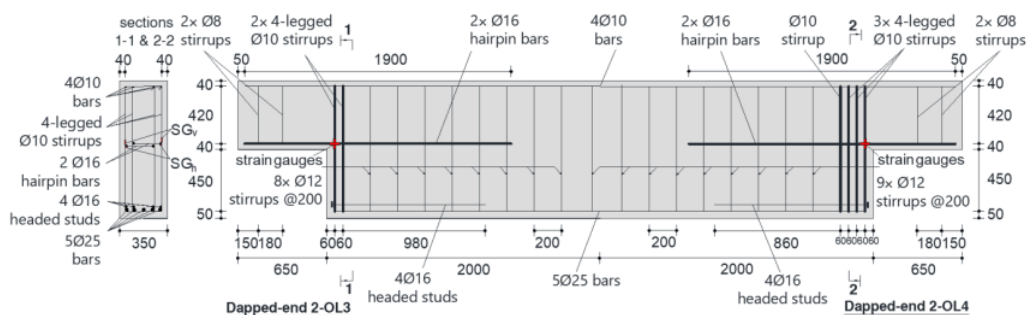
Geometry of the specimens and reinforcement layout [31]
